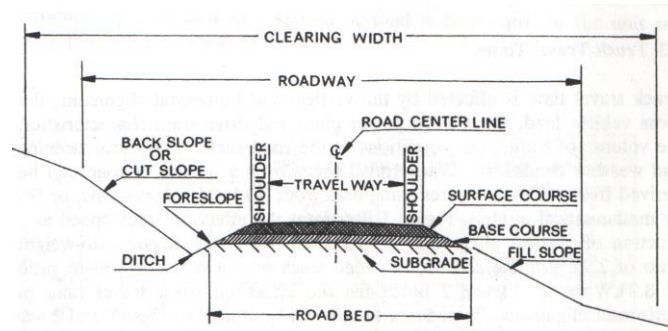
Forest road cross-section structures (Sessions and Heinrich, 1993).
